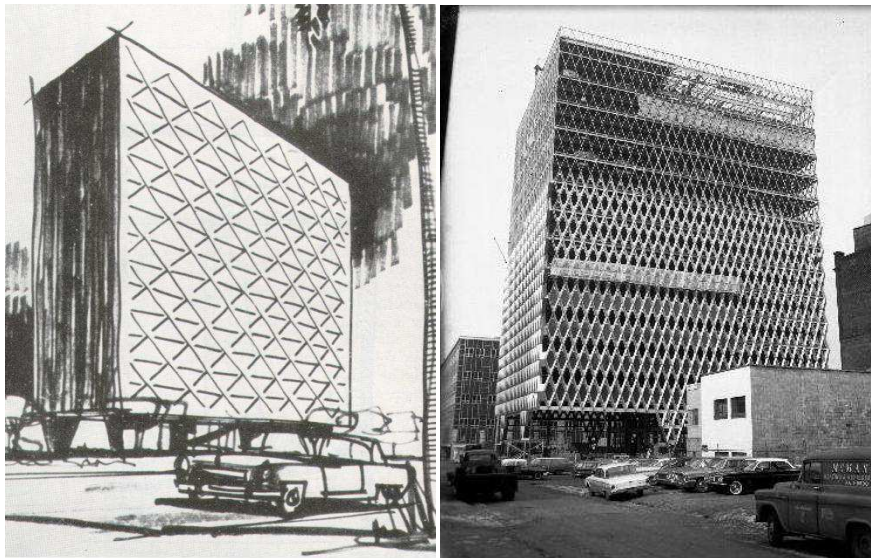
On the left sketch of a proposed triangulated wall façade for multistory buildings, on the right the former IBM Pittsburgh building, now United Steel Workers Building
